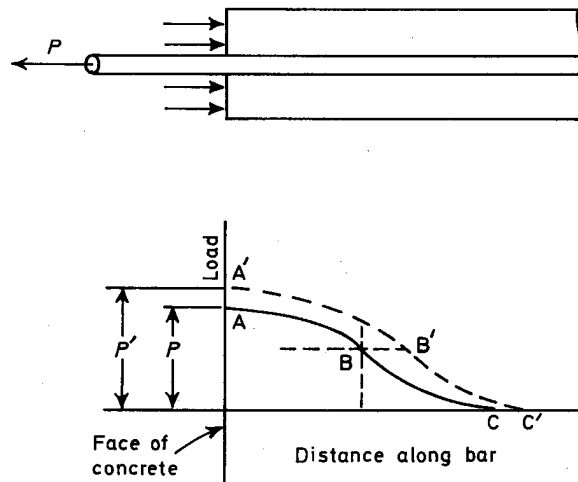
Pull-out test of reinforcing bars [Wilby, 1991]
